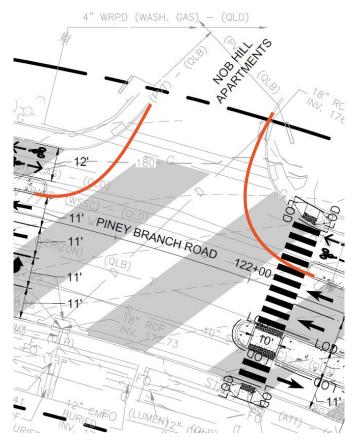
Potential Curb Radii Changes at Nob Hill Apartments Driveway
